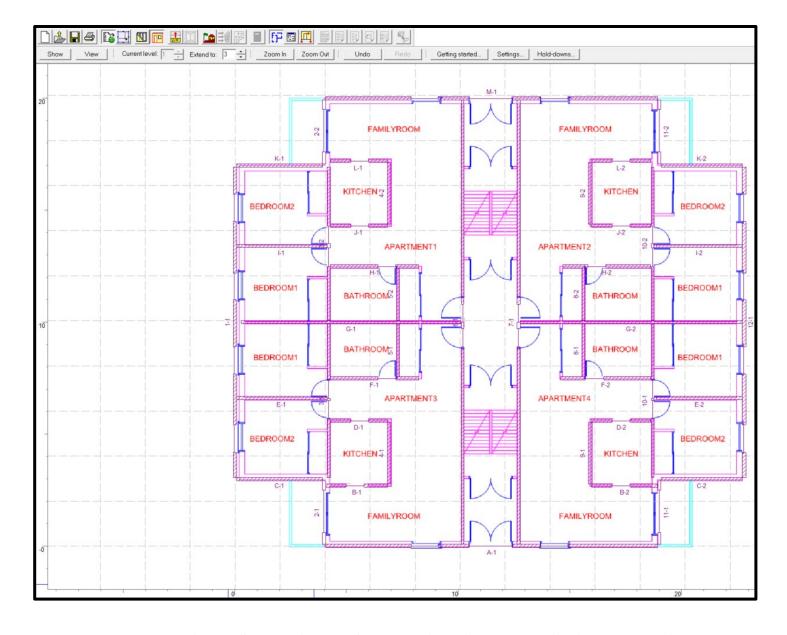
Shearwalls Tutorial 6 – Level 1 Door and Window Openings (With CAD Drawing)
